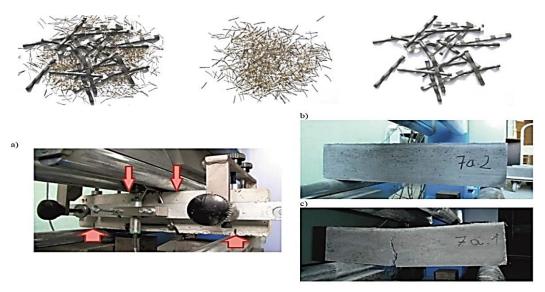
Concrete specimens tests by Pajak and Ponikiewski [29].
